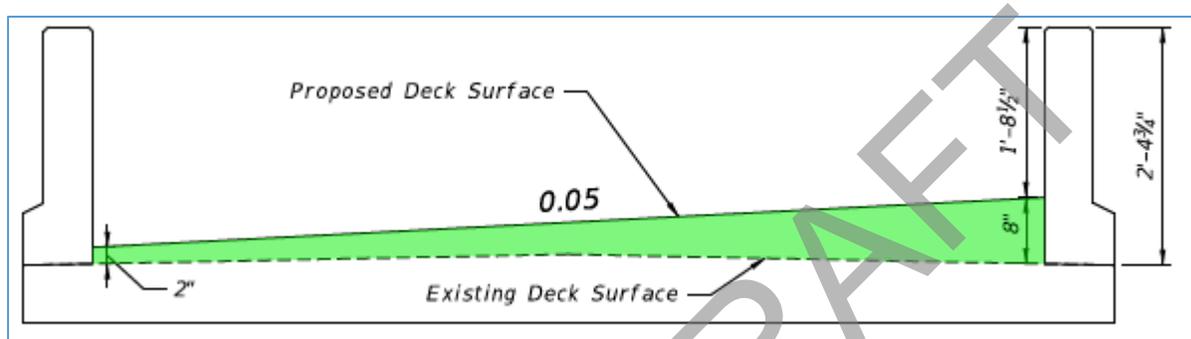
POTENTIAL 5% SUPERELEVATION
